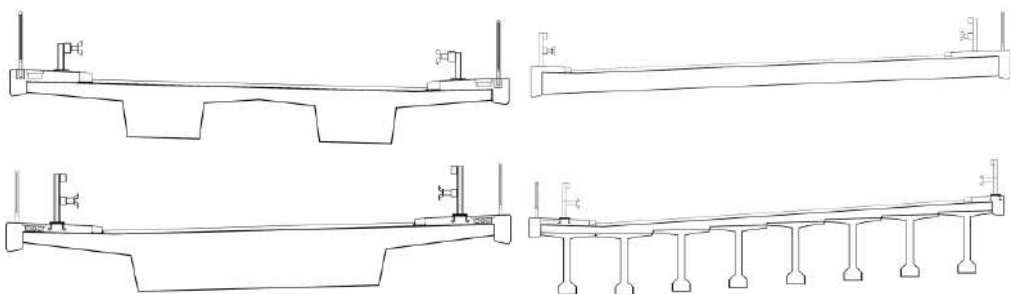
Typical Serbian cast-in-place concrete bridge superstructure (left upper, left lower, and right upper) and precast posttensioned beam bridge cross section (right lower)
